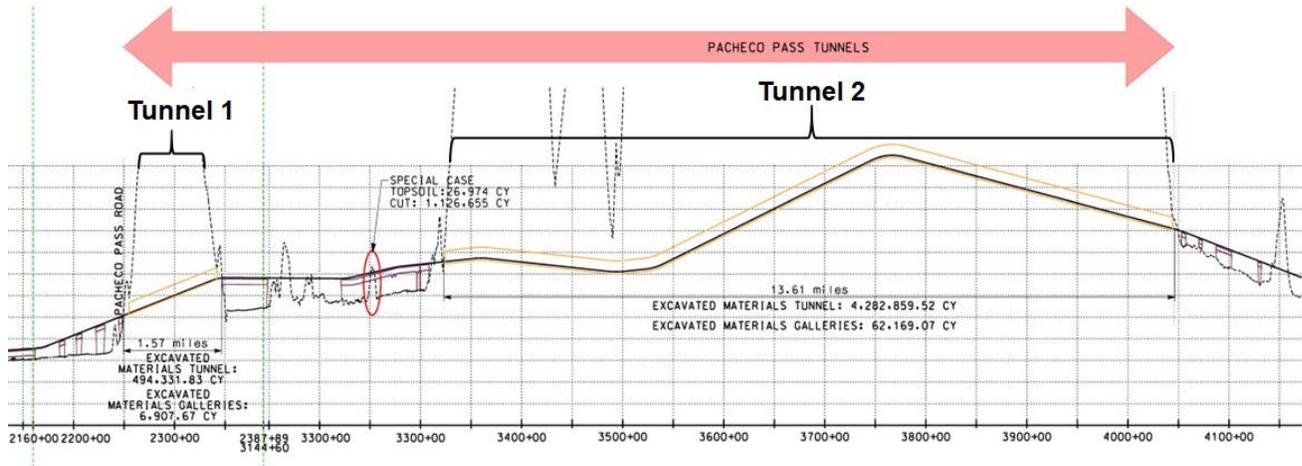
Longitudinal section of Pacheco Pass tunnels
